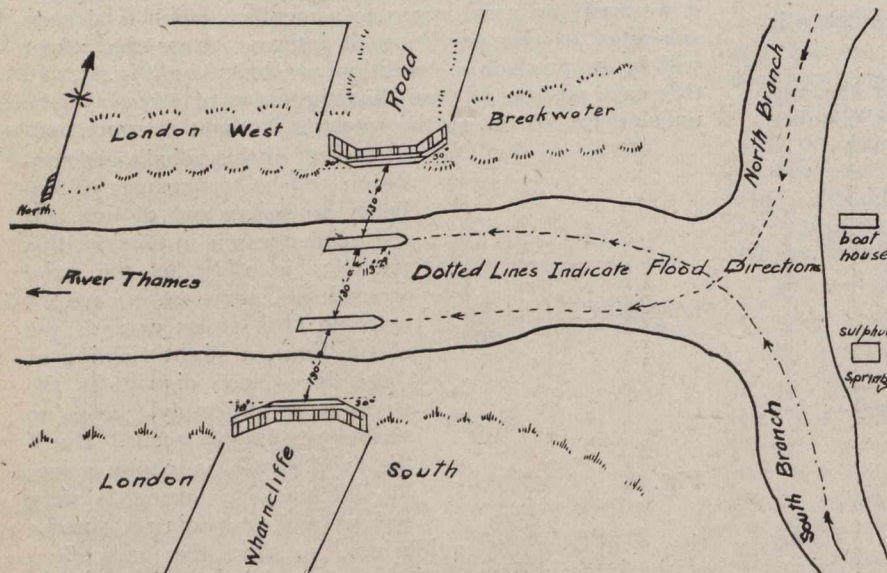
Location and Layout of the Wharncliffe Highway Bridge, London, Ont.
